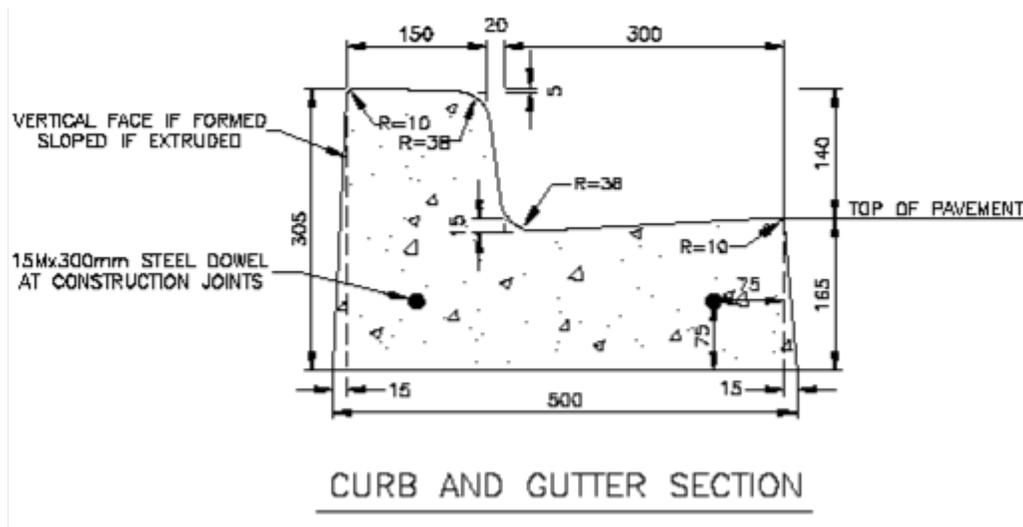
B.3 - Curb and Gutter Section as Composite Gutter
